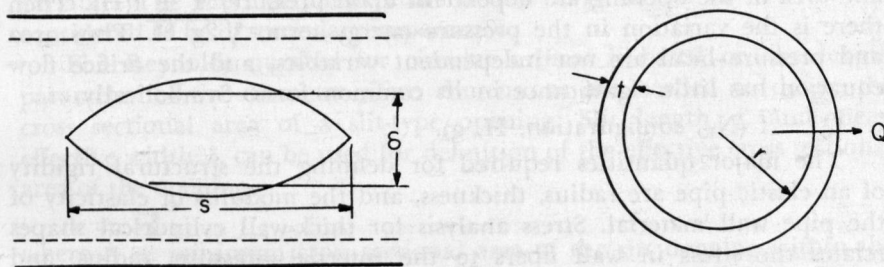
Definition sketch for longitudinal slits in pipe wall. Internal pressure causes separation in pipe wall. Mean slit width $\delta = A/s$, where A is cross-sectional area of slit opening.
